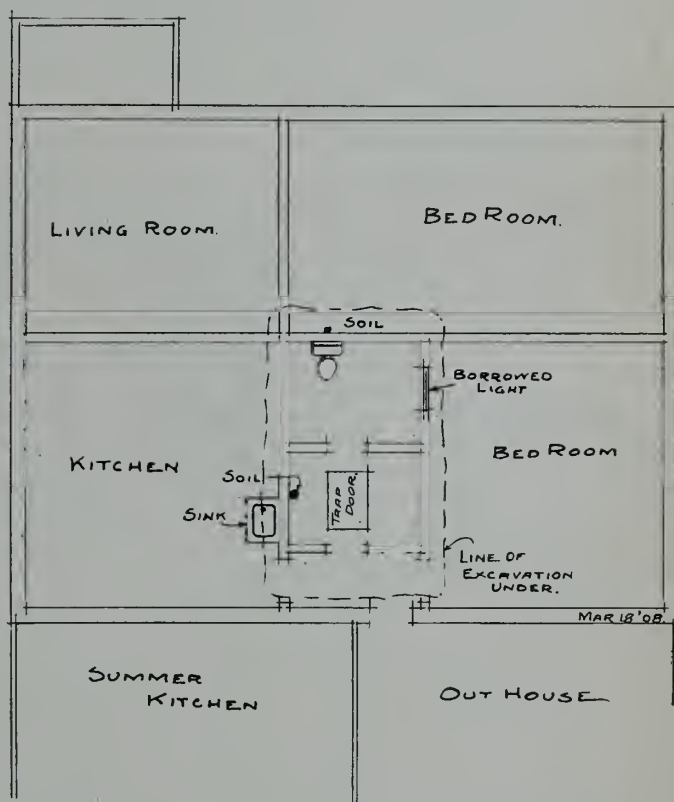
Floor Plan Showing Enclosed W.C. in Western Town.
